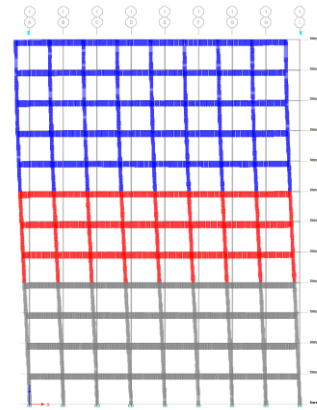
Finite element mode of the frame building using ETABS 18.
